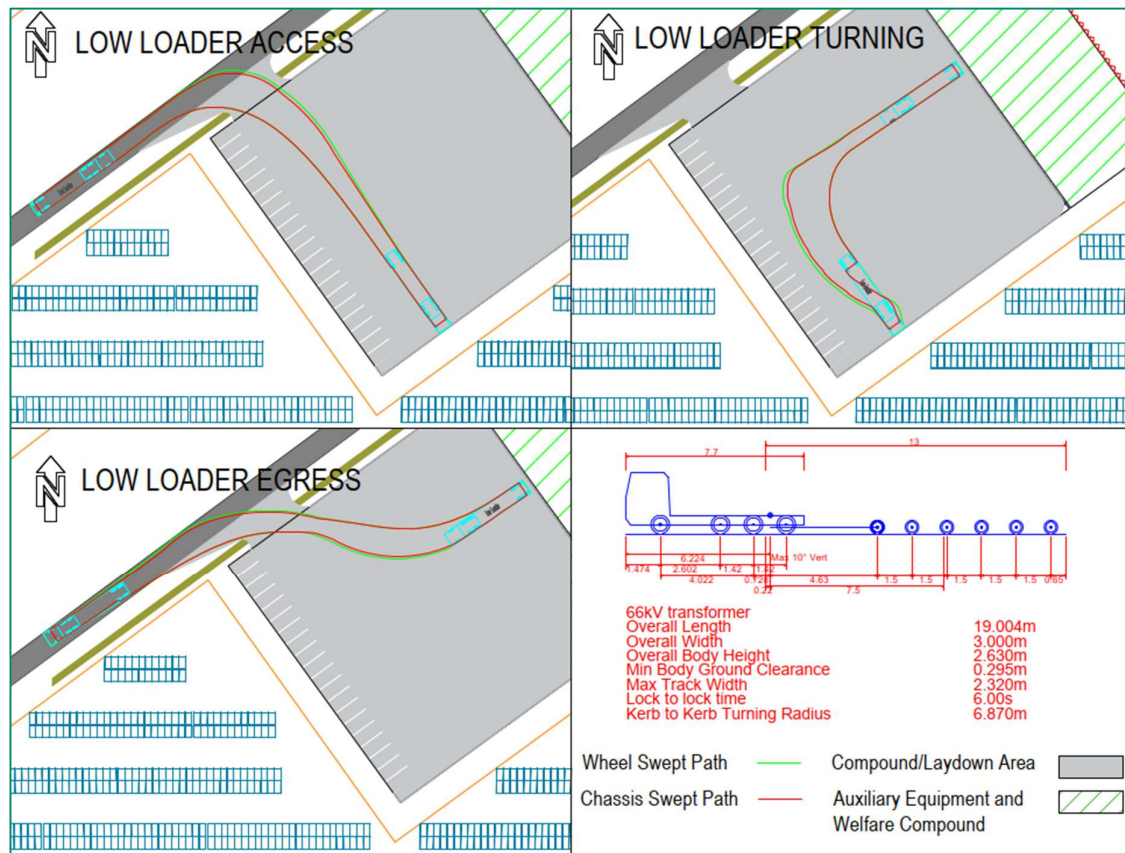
Construction Compound / Laydown Area General Arrangement
